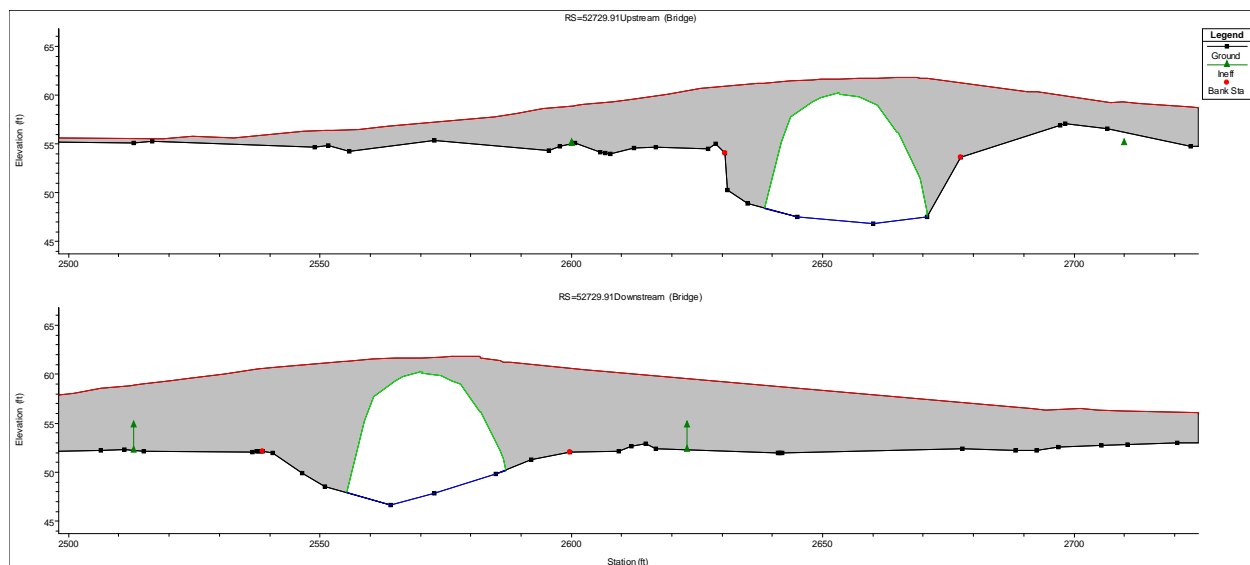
Cross Section of Old Bridge Street Bridge in Corrected Effective Model
